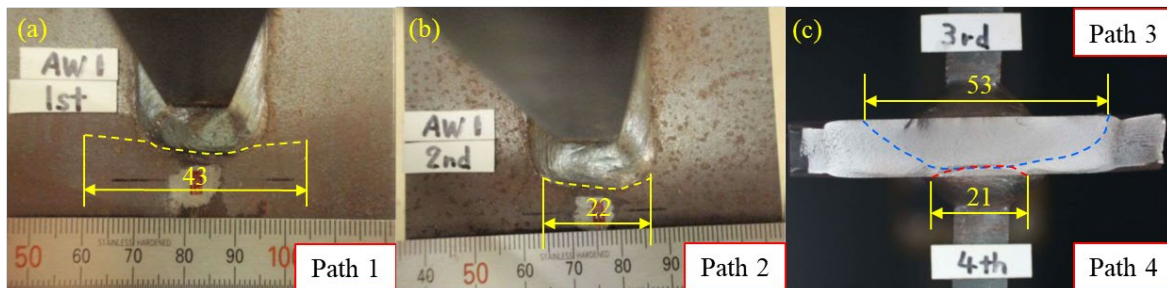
Fatigue failure of specimen S1 (a) crack growth at the weld end of Path 1 (b) crack growth at the weld end of Path 2 (c) fracture surface at the weld ends of Path 3 and Path 4
